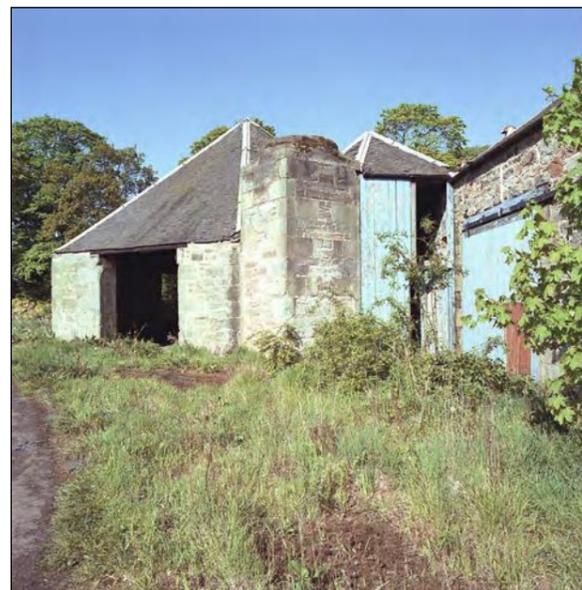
Range A, East elevation showing doorway into the steam engine house.
